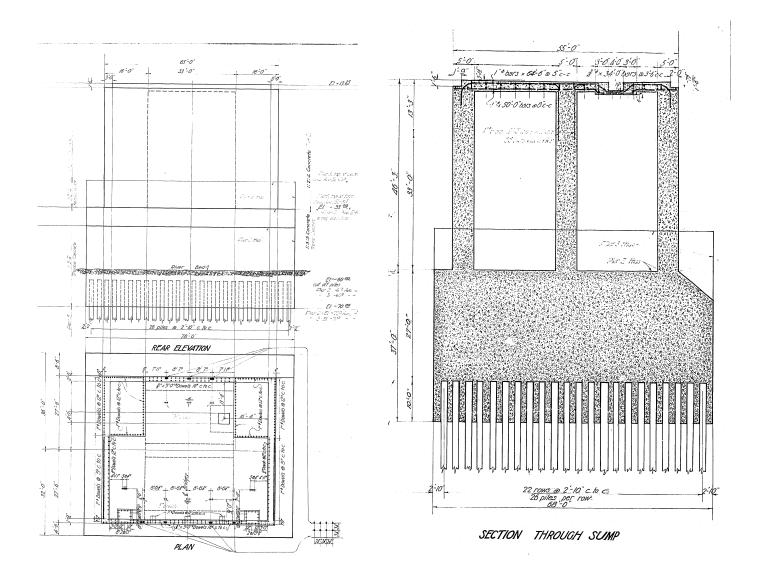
Burnside Bridge Movable Spans Piers 2 & 3, foundation piles (outer piles) in both compression and uplift
